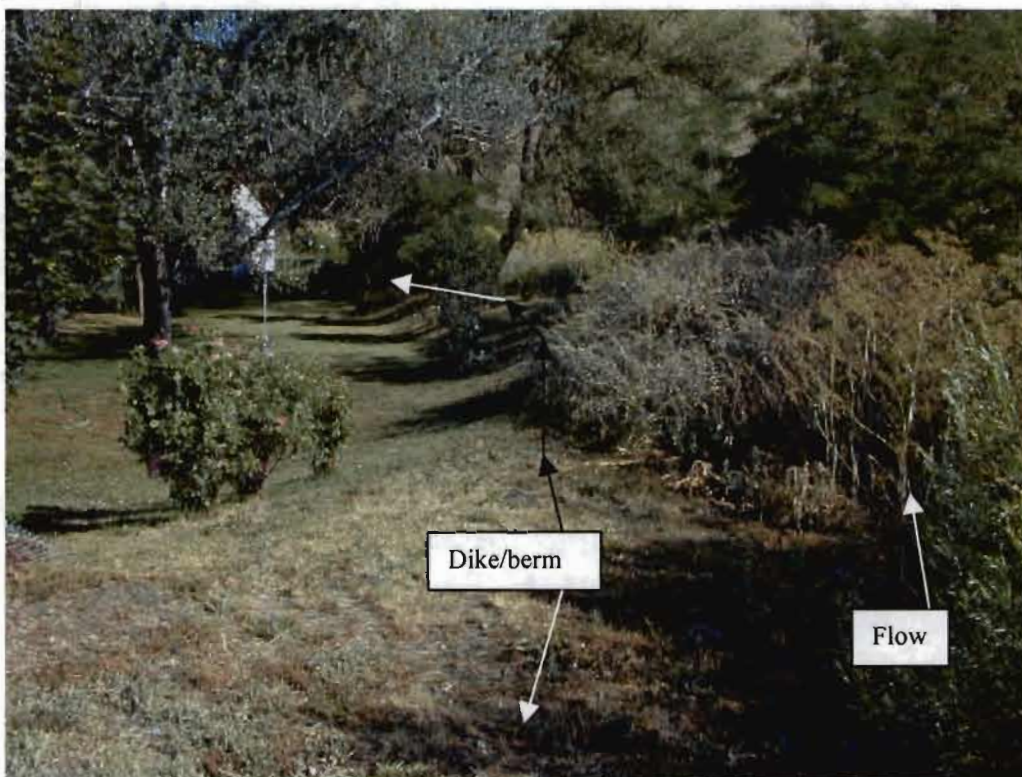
View looks downstream from bridge on Tutuilla Creek Road. Shows rudimentary dike/berm along left bank.
